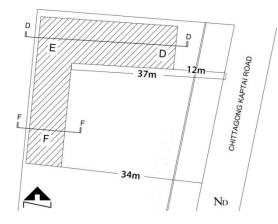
Study Area 2 (School Z), adjacent to Chittagong Kaptai Road.
